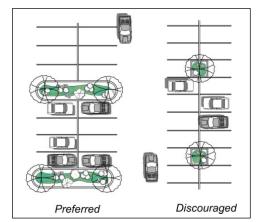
Preferred Method for Parking Lot Tree Planting
